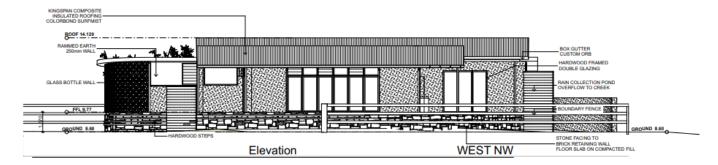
Extract of elevations plan for proposed new 3-bedroom dwelling.
